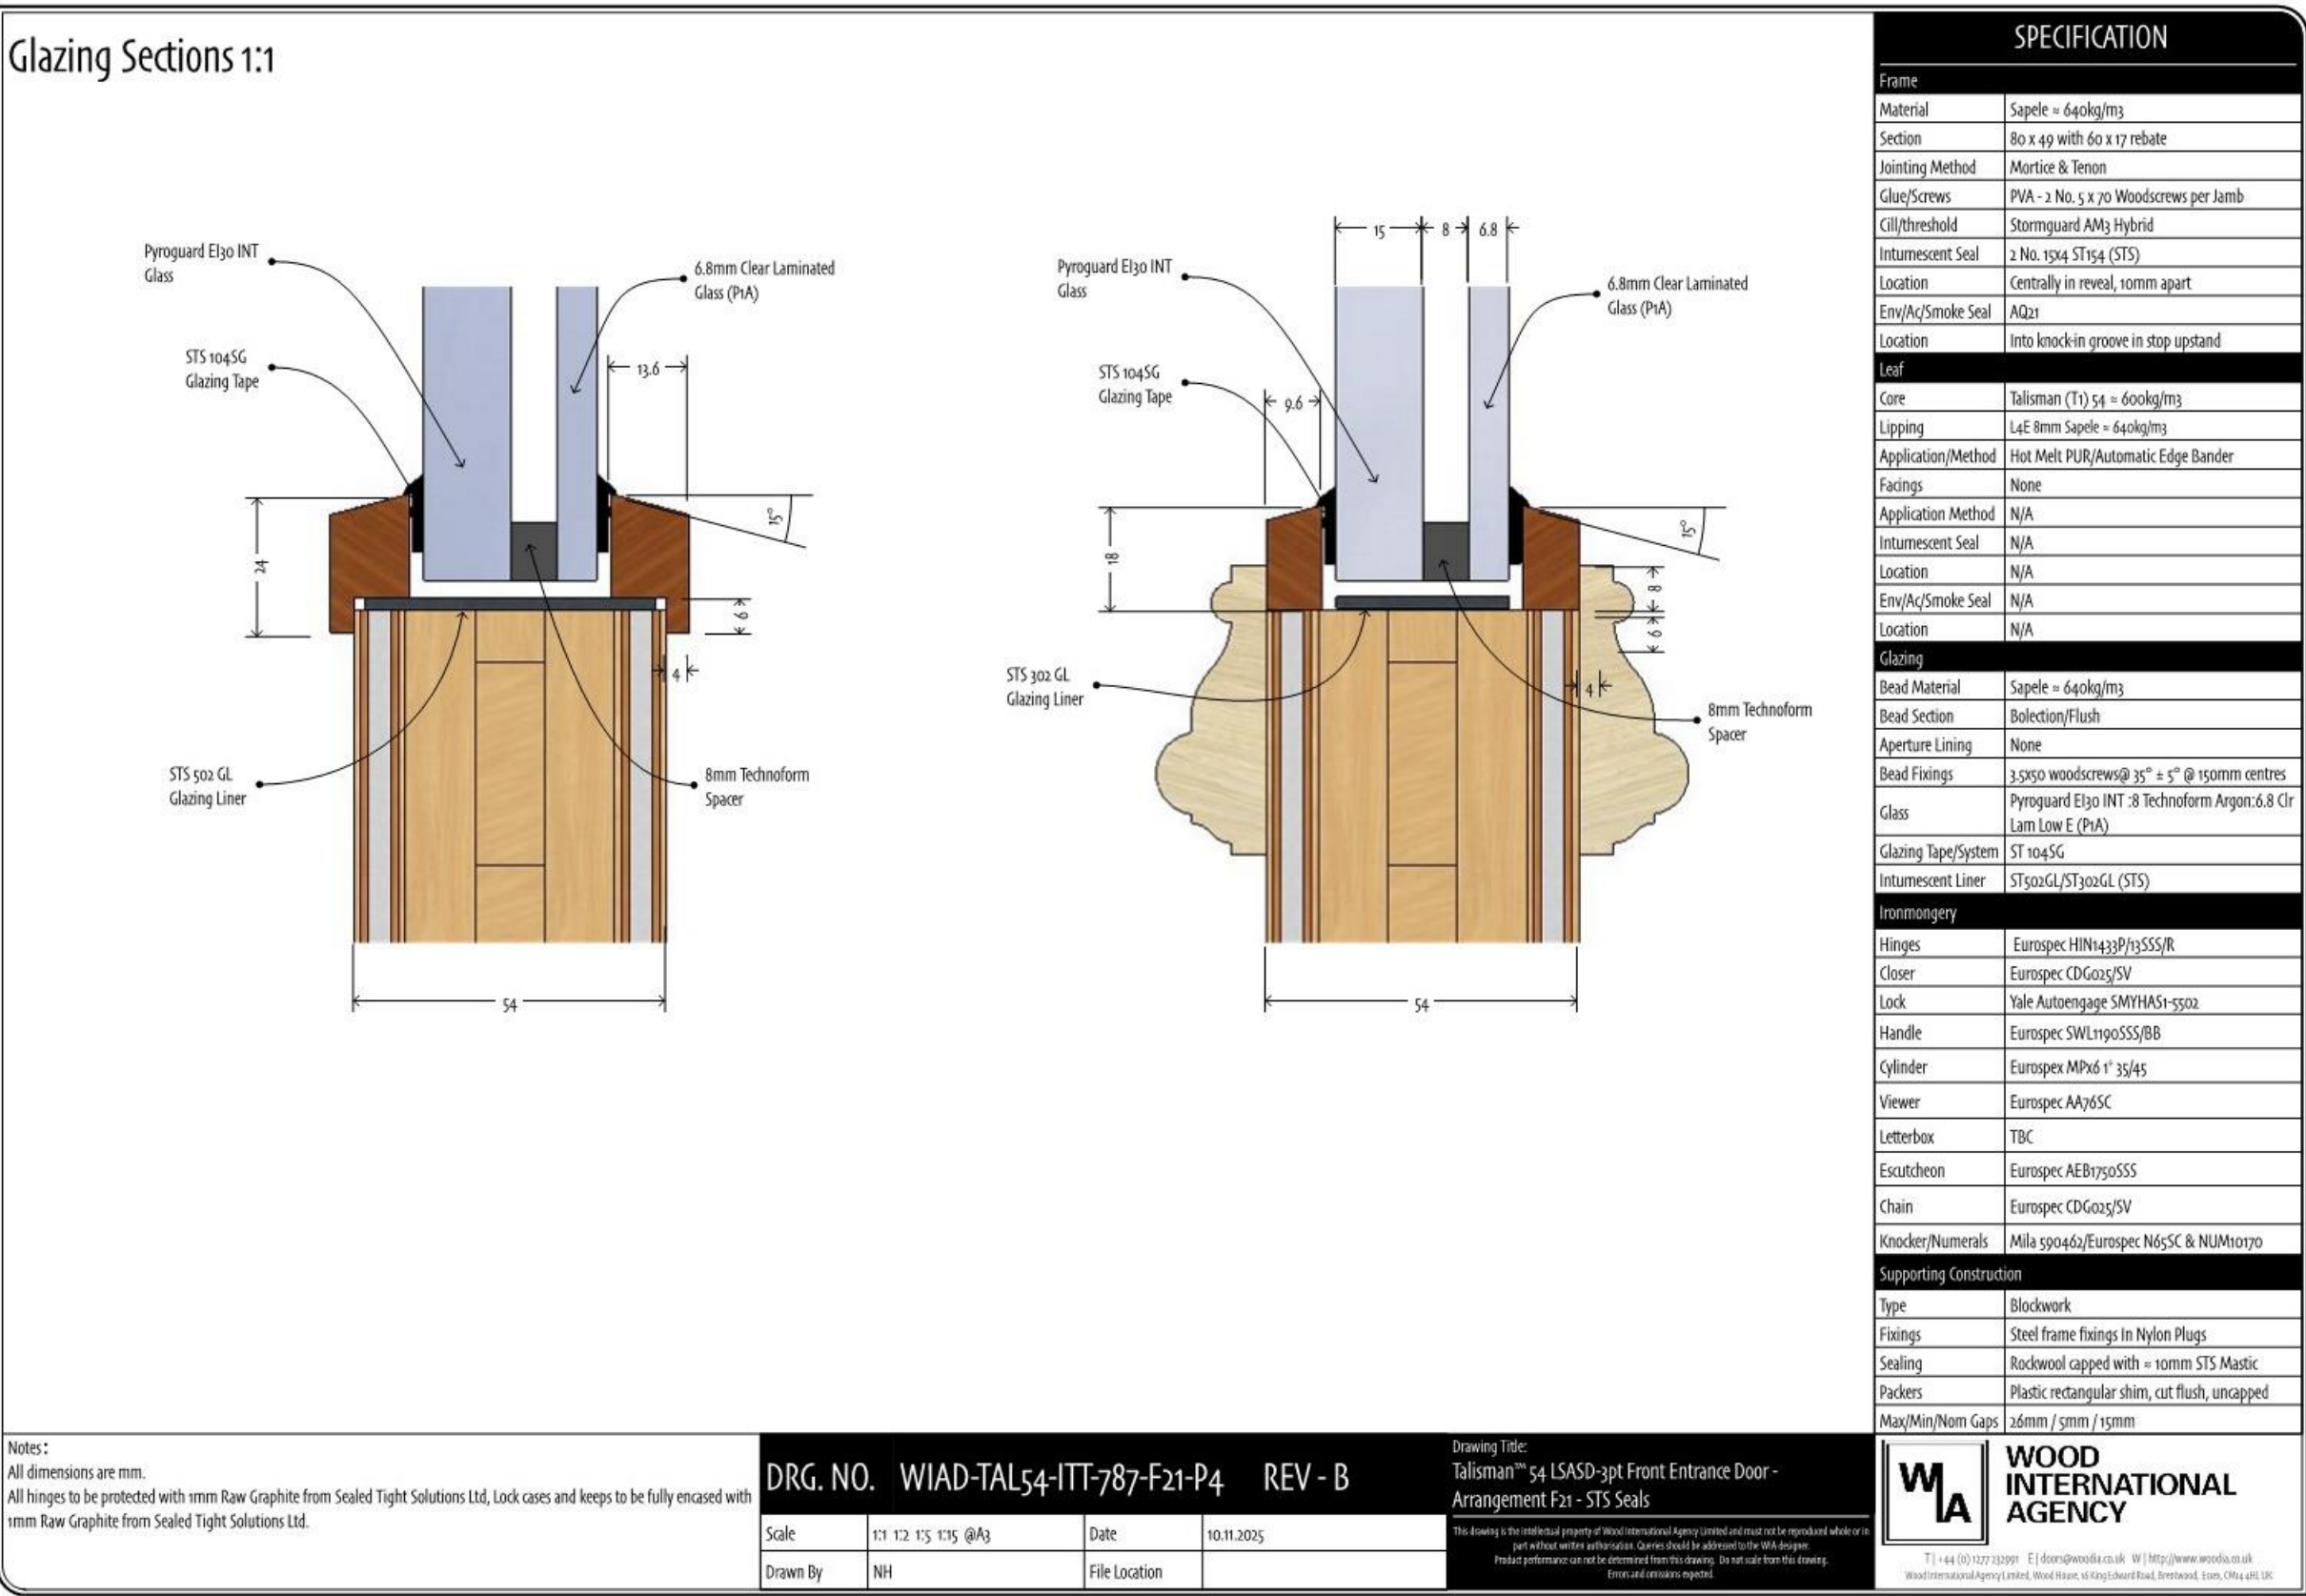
Drawing WIAD-TAL54-ITT-787-F21-P4 Rev B
